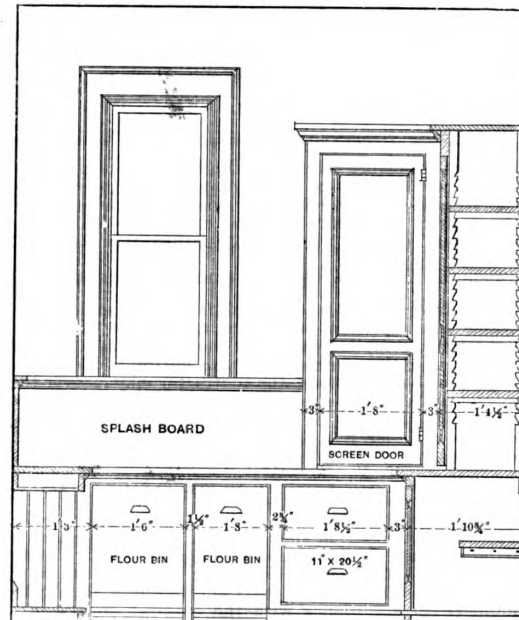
Elevation in Pantry, Looking Toward the Window.—Scale, $\frac{3}{8}$ Inch to the Foot.
